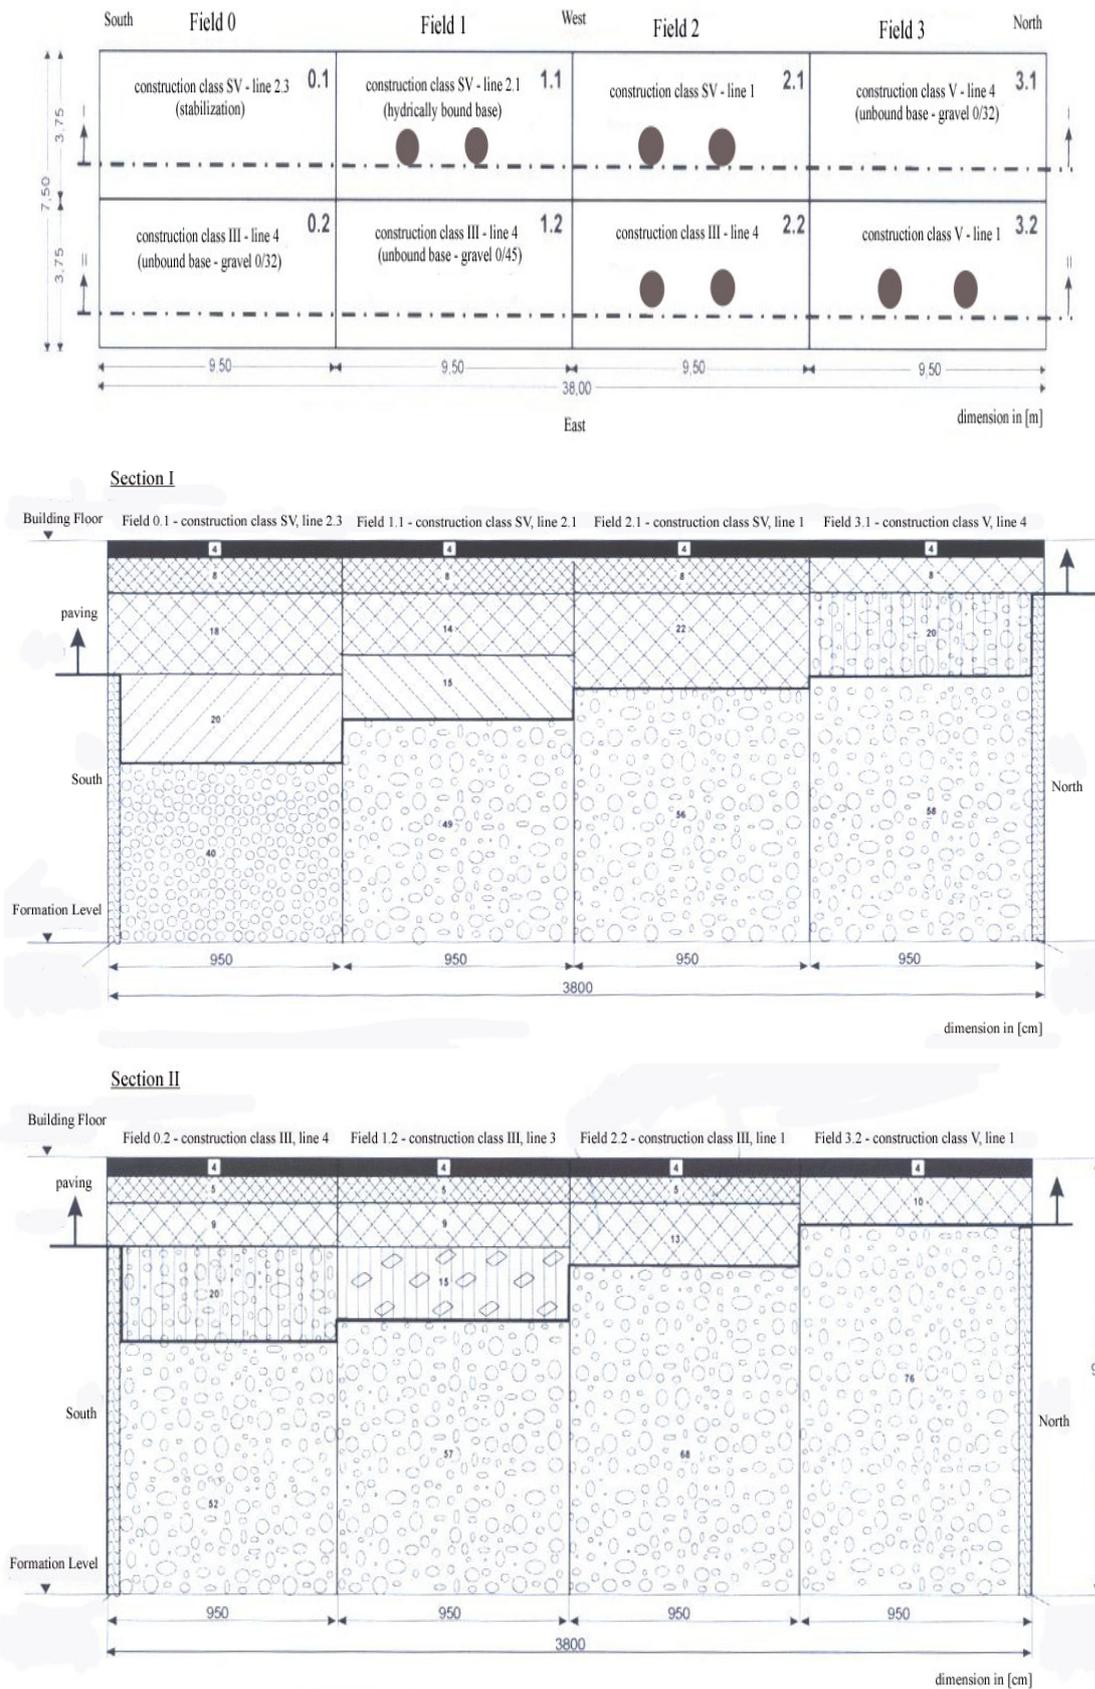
Top and cross-section view of test track at BAsT and FWD testing points
